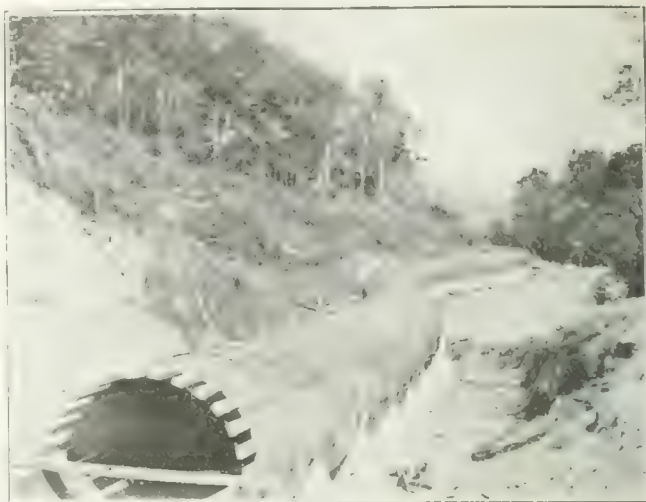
WOOD-STAVE PIPE UNDER CONSTRUCTION
